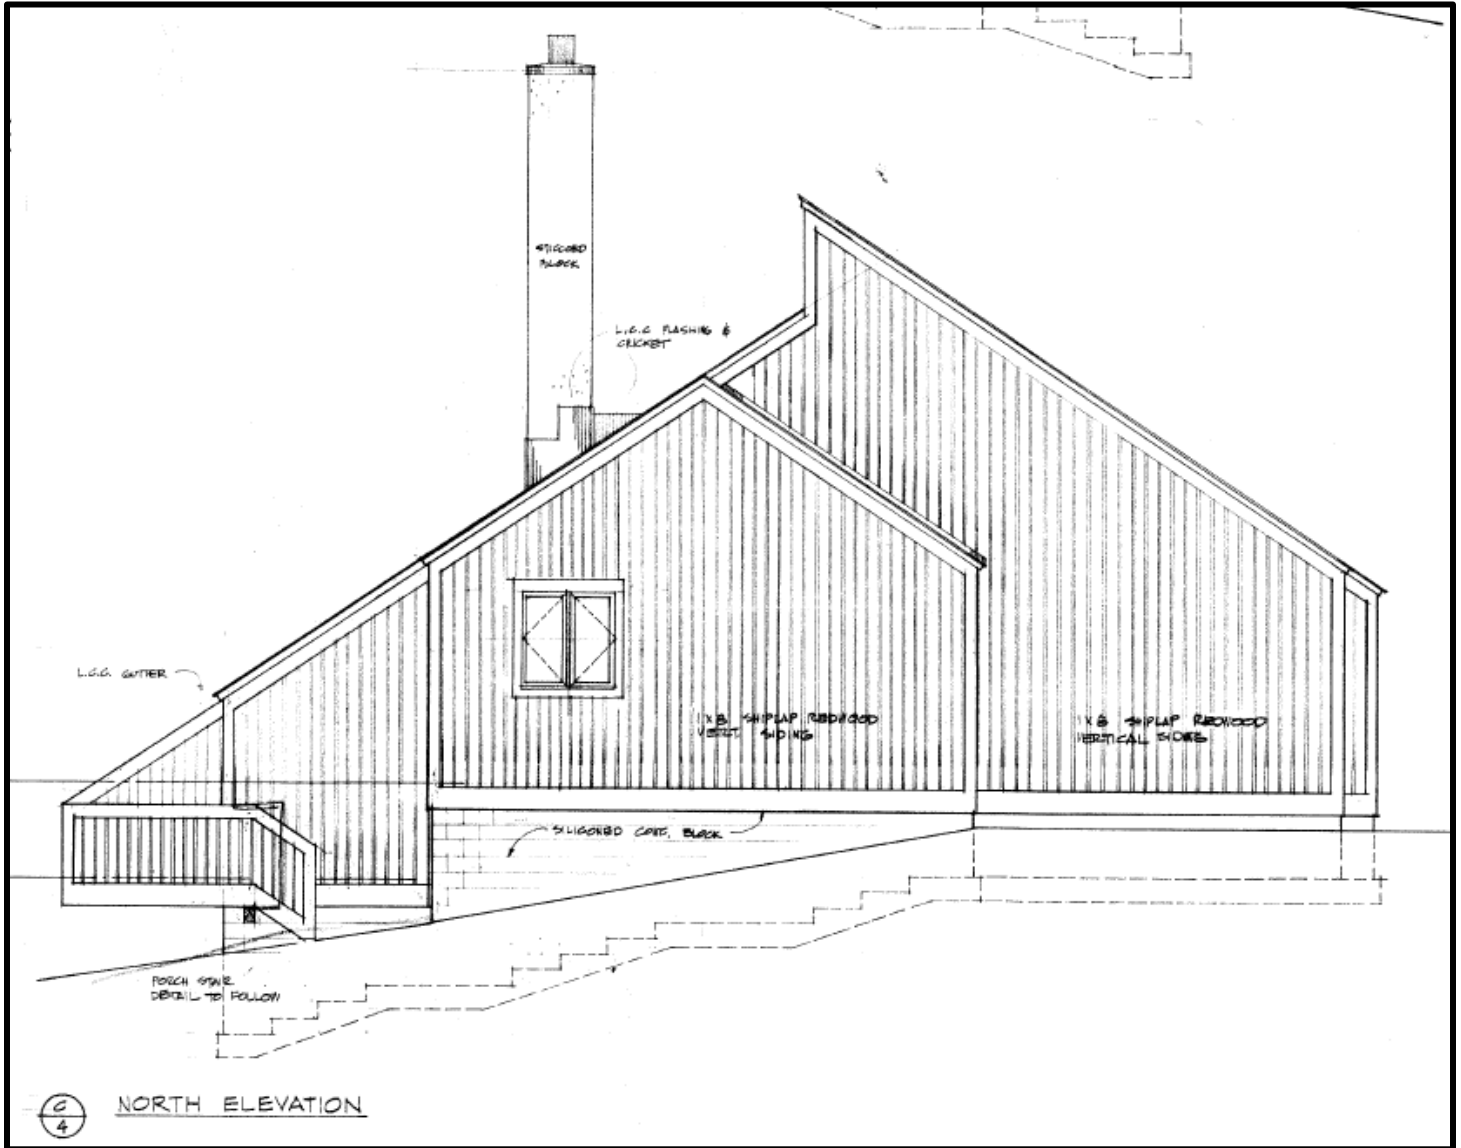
North Elevation, Guest House (Architect's drawings, 1962).
